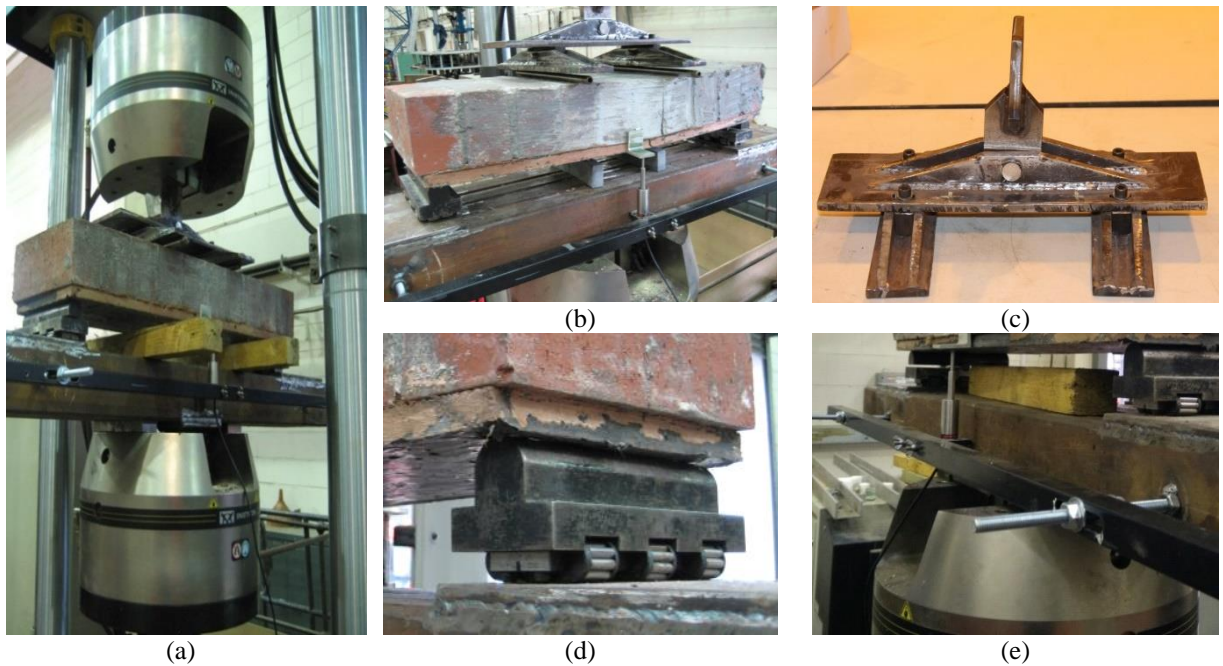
Four-point bending test setup a) Instron machine, b) Loading rig, supports and LVDT positions, c) loading rig d) support e) LVDT holder
